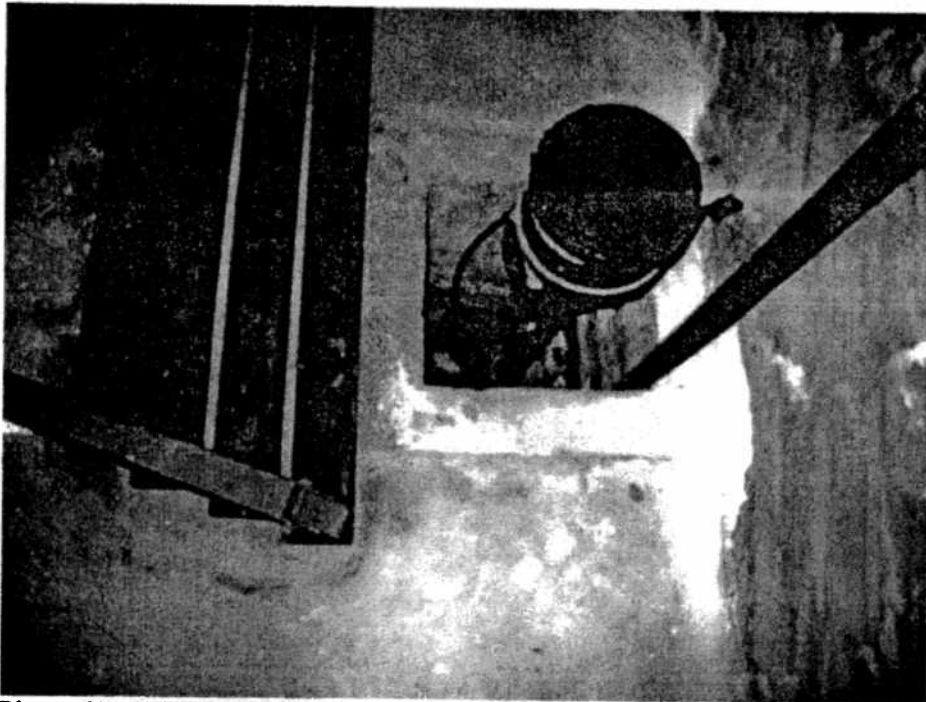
IFR sump pump located on the west wall south of the center of the IFR.
